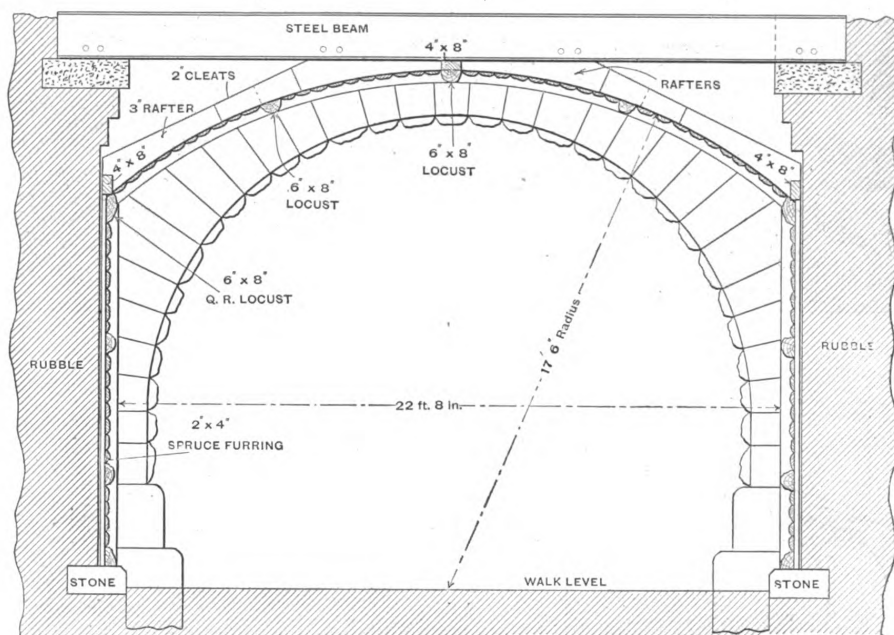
Cross Section of Archway in Central Park at 110th Street, New York City.—Scale, 3-16 Inch to the Foot.
